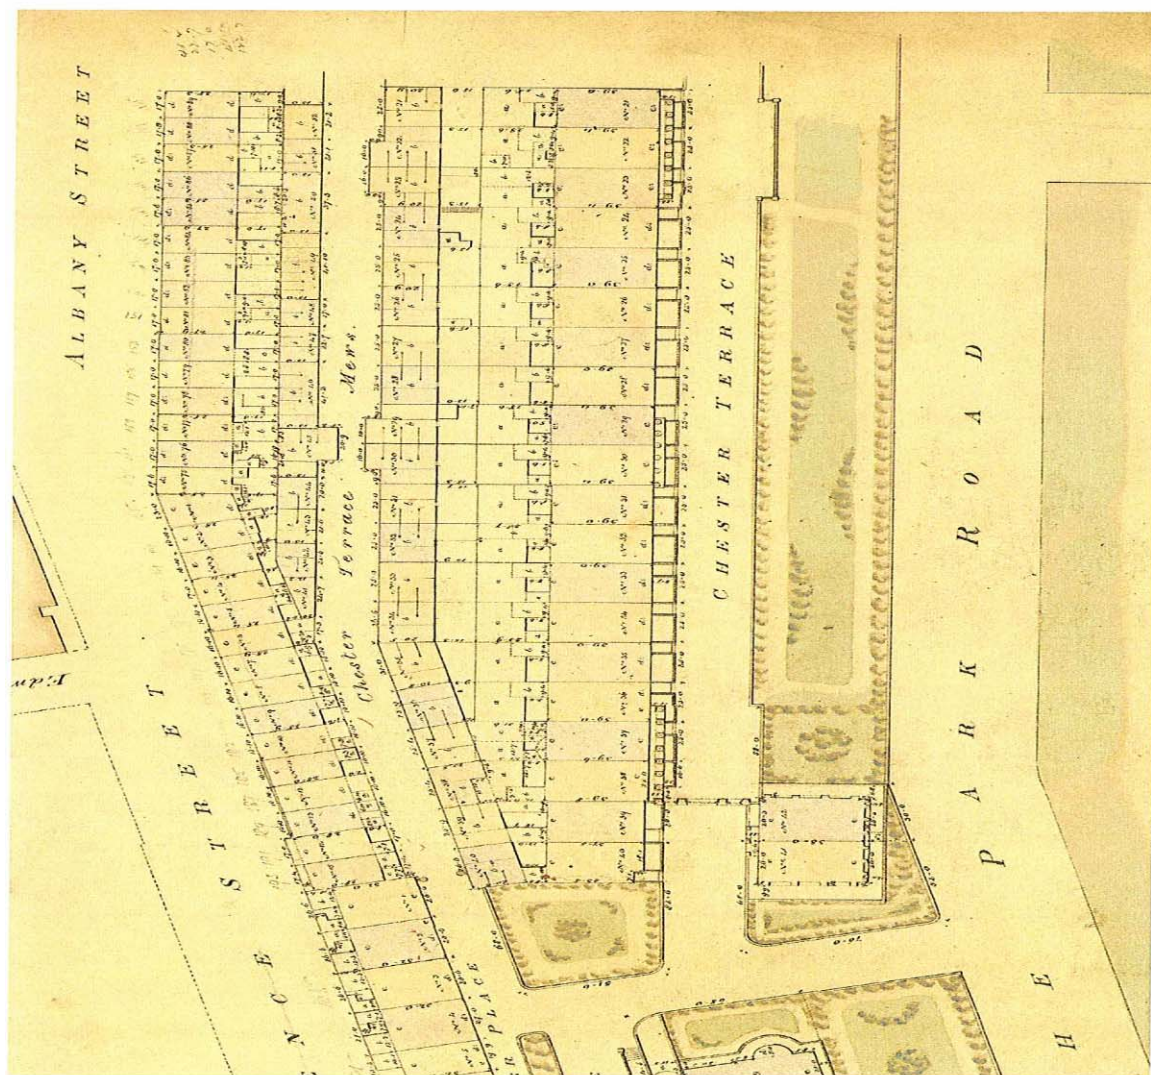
Extract Mayhew's Plan – Chester Terrace 1835 – The Crown Estate Archives
